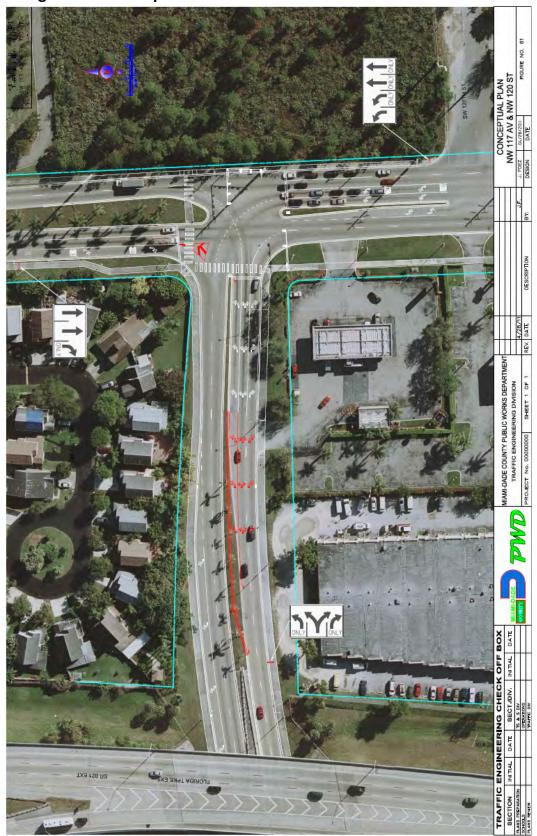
Conceptual Plan – SW 117 Avenue and SW 120 Street
